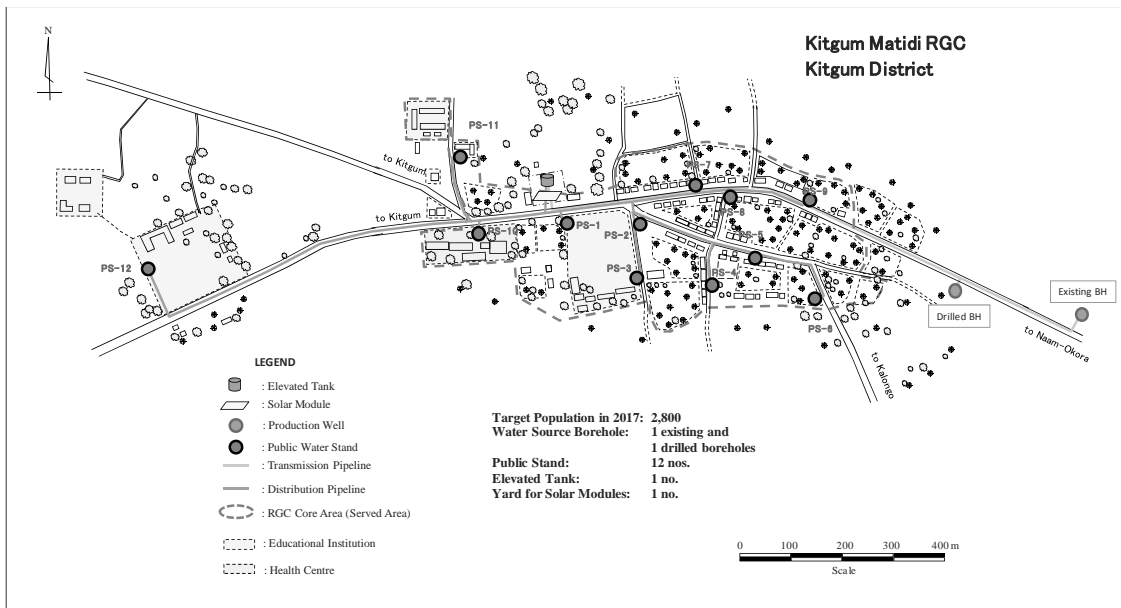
General Plan of Piped Water Supply Facility (Kitgum Matidi RGC)
